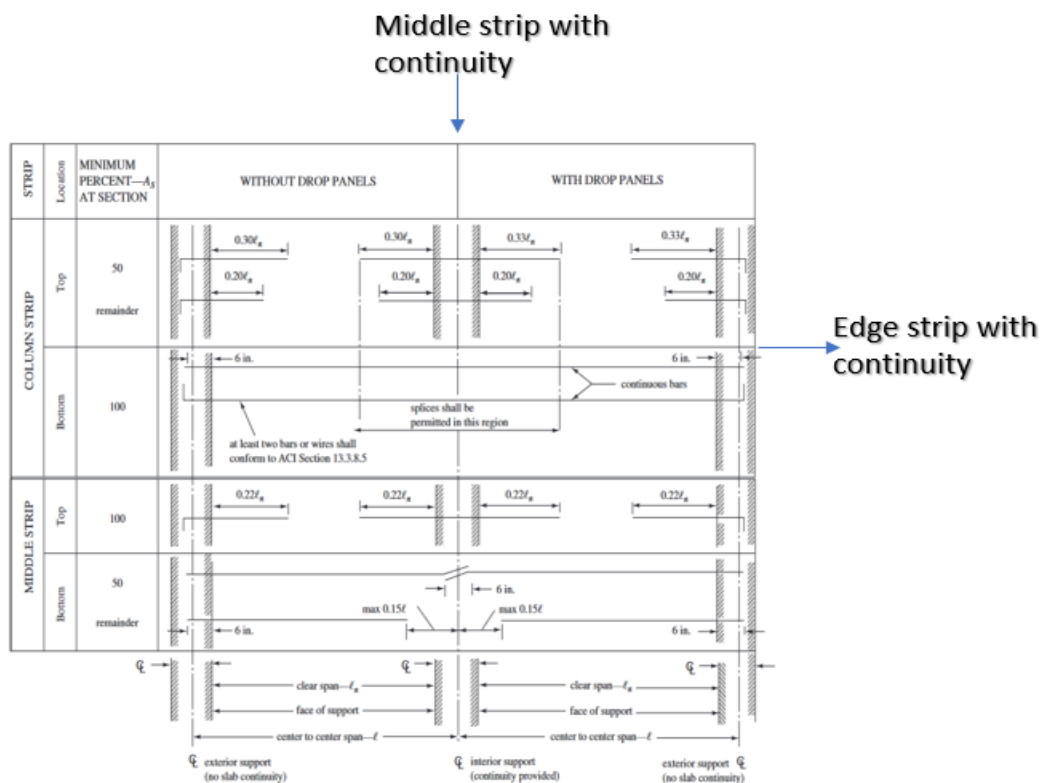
Minimum Reinforcement Extension for Slabs without Beams(Source: Adapted Darwin & Charles, 2021) [84]
